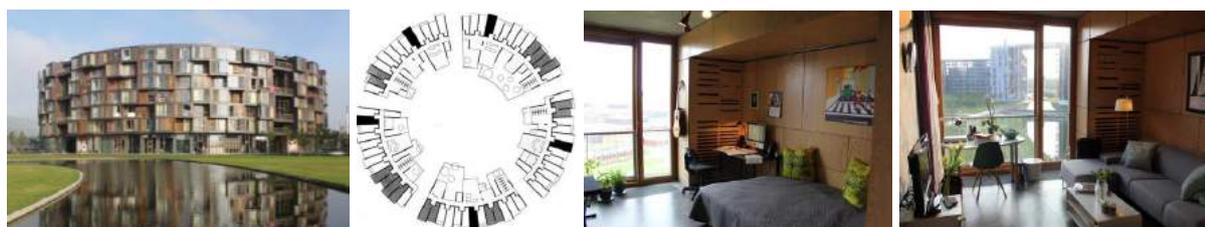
Exterior appearance of the dorm; Floor plan of standard residential floor of the dorm; Interior appearance of the living units; Architectural studio Lundgaard & Tranberg Arkitekter [11] (<http://www.dac.dk/en/dac-life/copenhagen-x-gallery/realized-projects/tietgenkollegiet/>)
